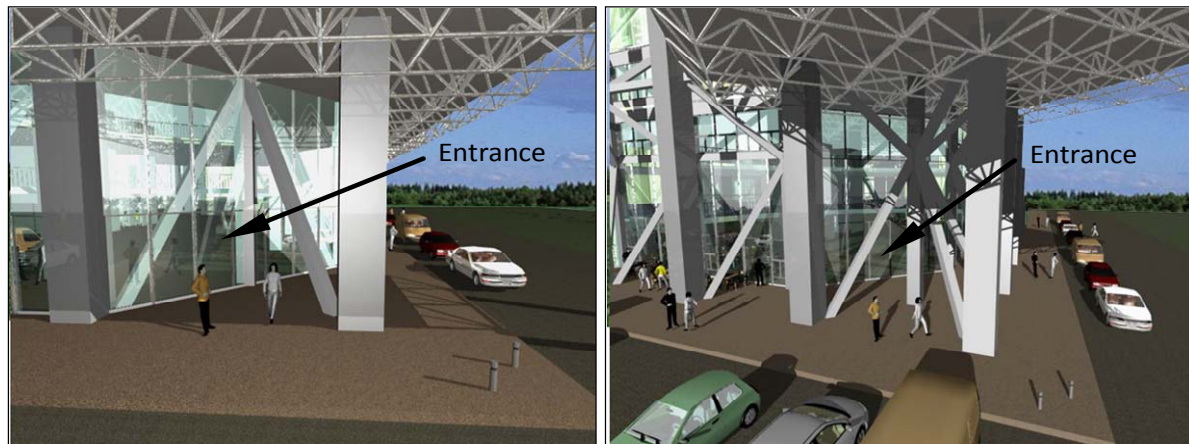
(a) An entrance for a building with the external façade; (b) An entrance for a building with the internal façade
